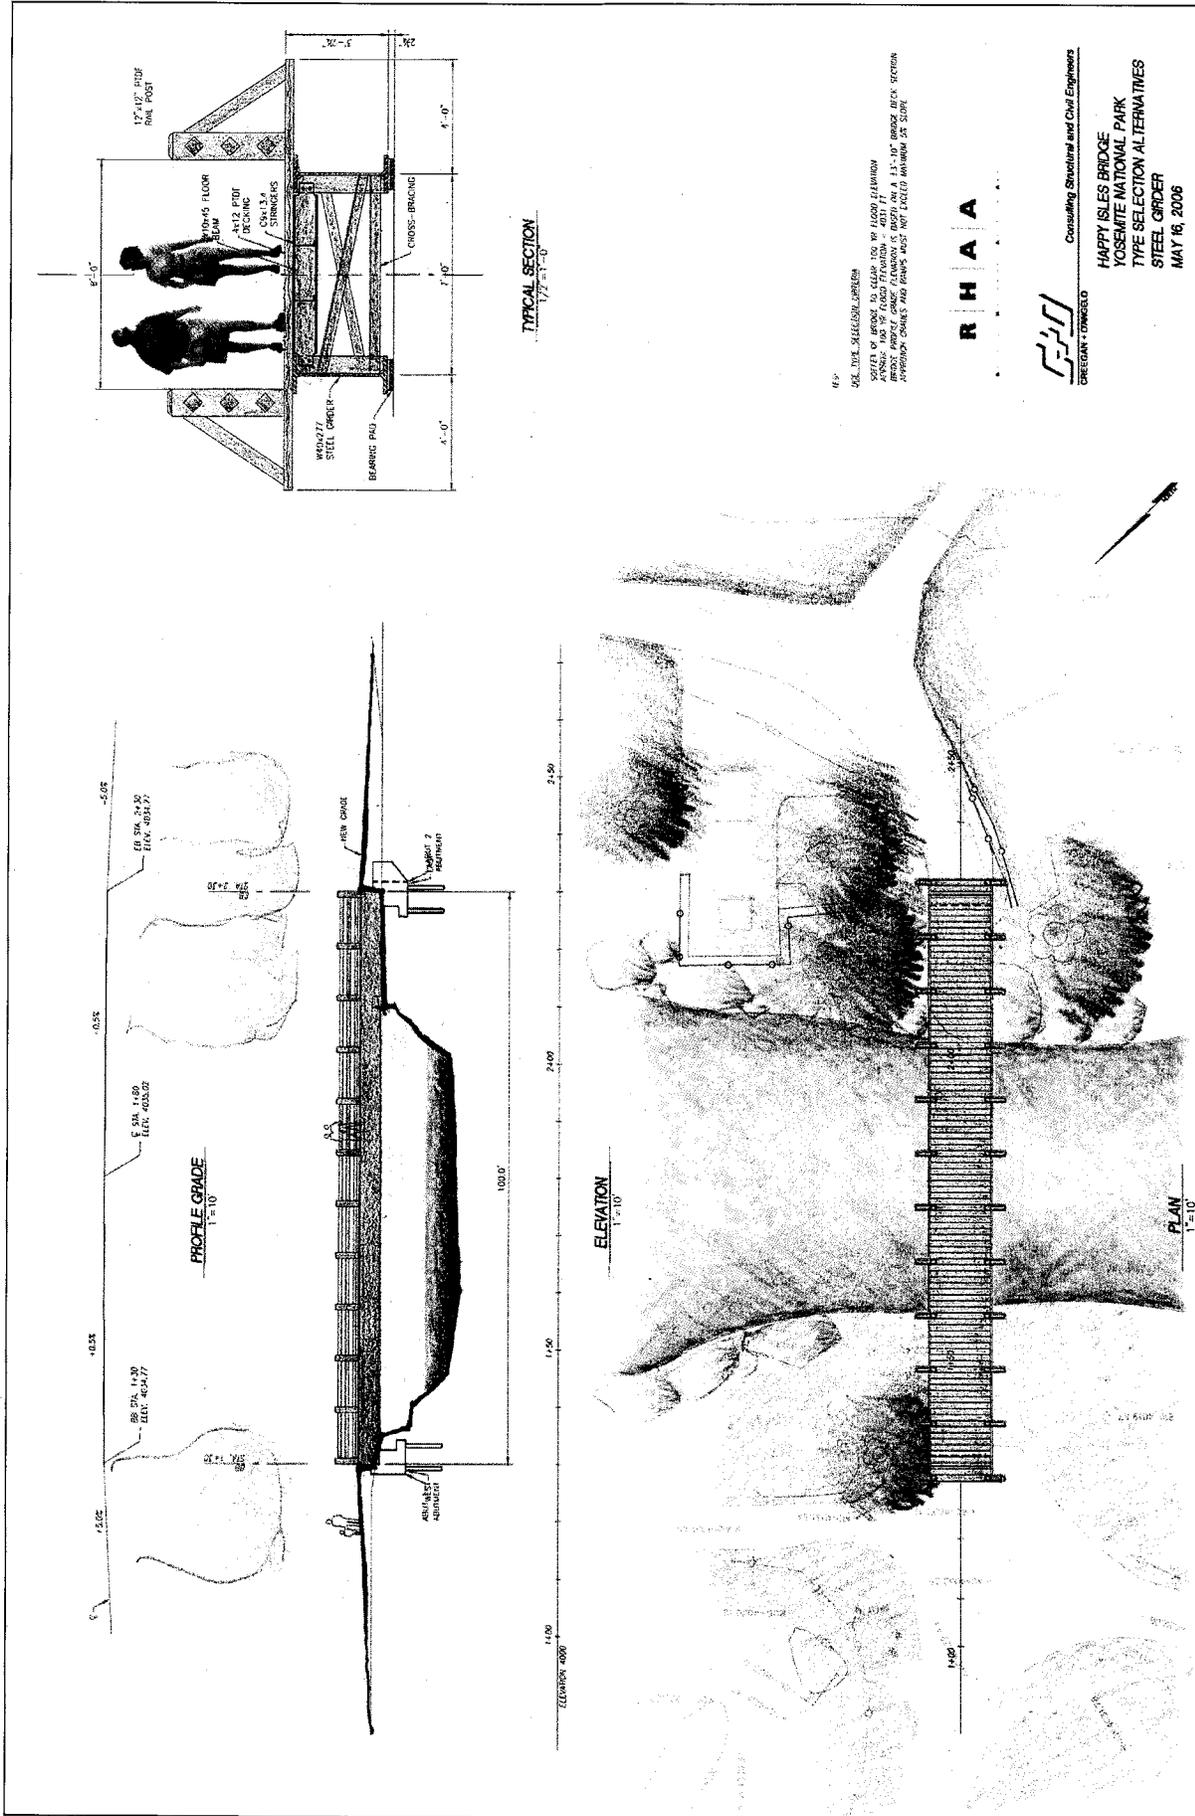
Steel Girder Bridge with Wood Deck: profile grade, elevation, plan, and typical section drawings
